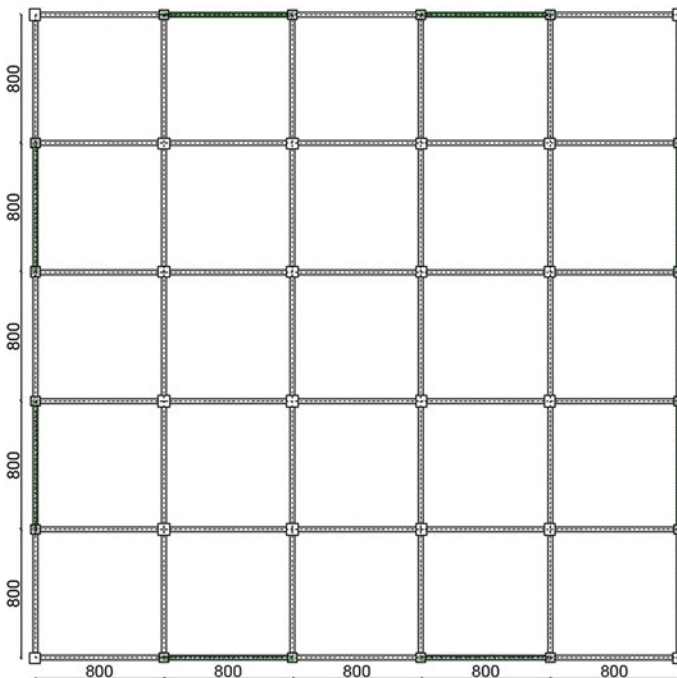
Horizontal layout of structural system (RC structural walls are highlighted in green)
